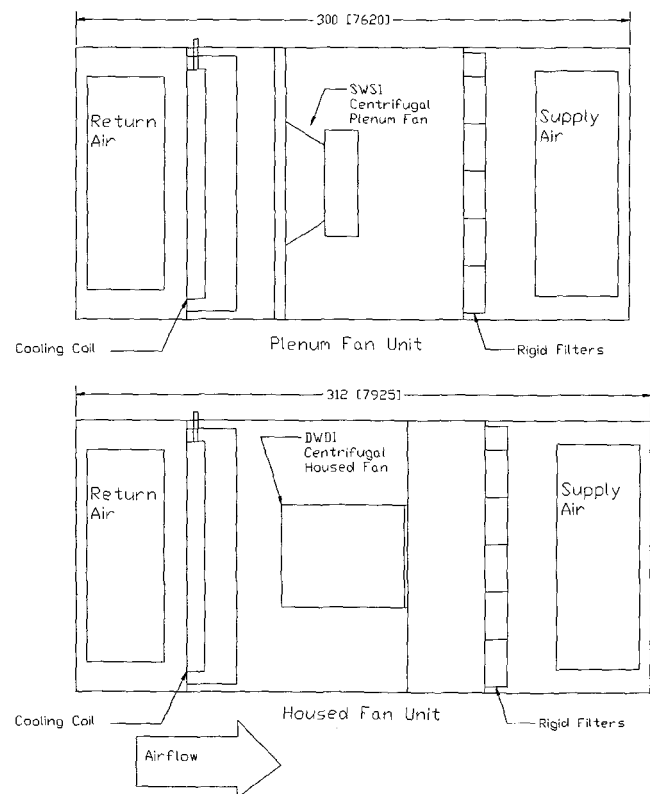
These drawings show typical layouts of simple, equivalent housed fan and plenum fan-based HVAC equipment. Lengths are in inches and mm.
